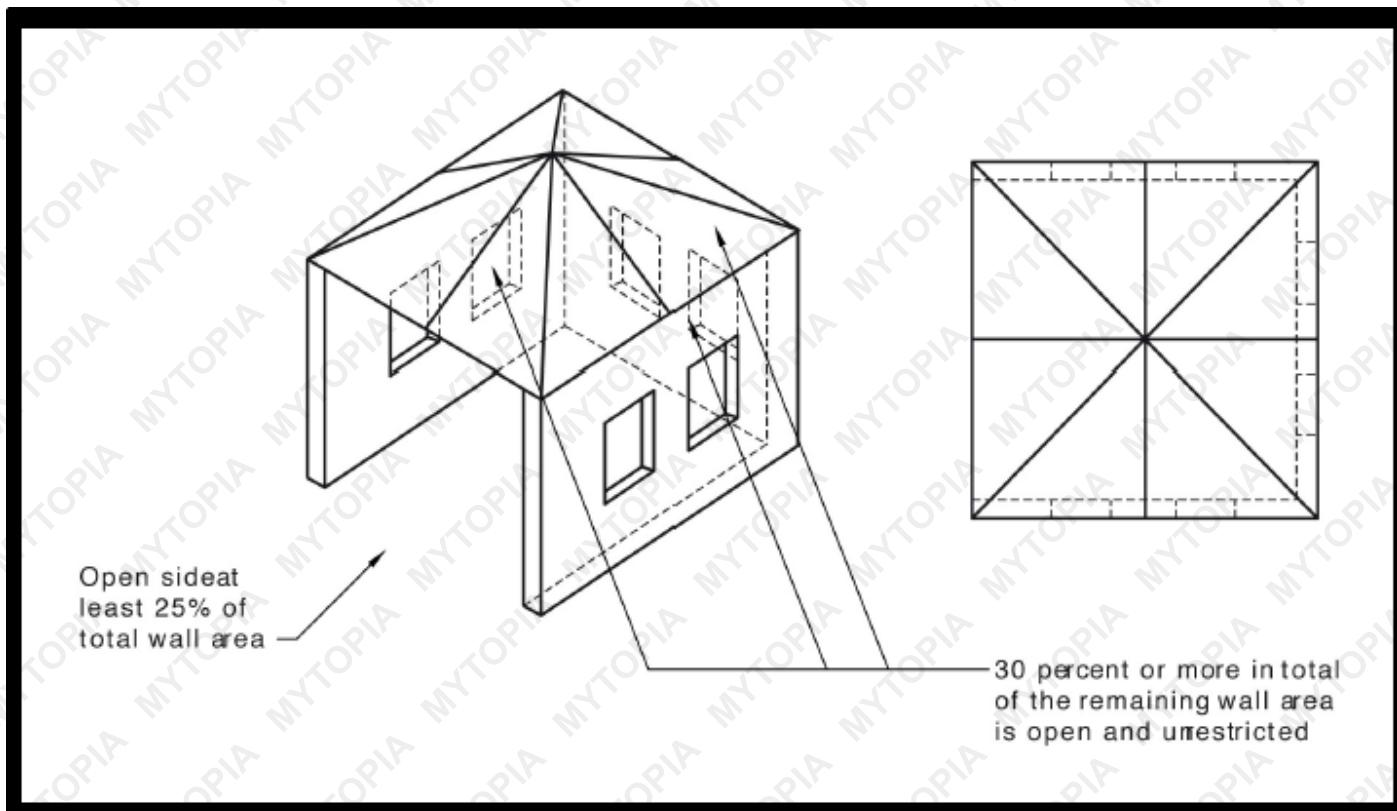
Outdoor Area. With the open side at least 25% of the total wall area and 30% or more in total of the remaining wall area is open and unrestricted.
